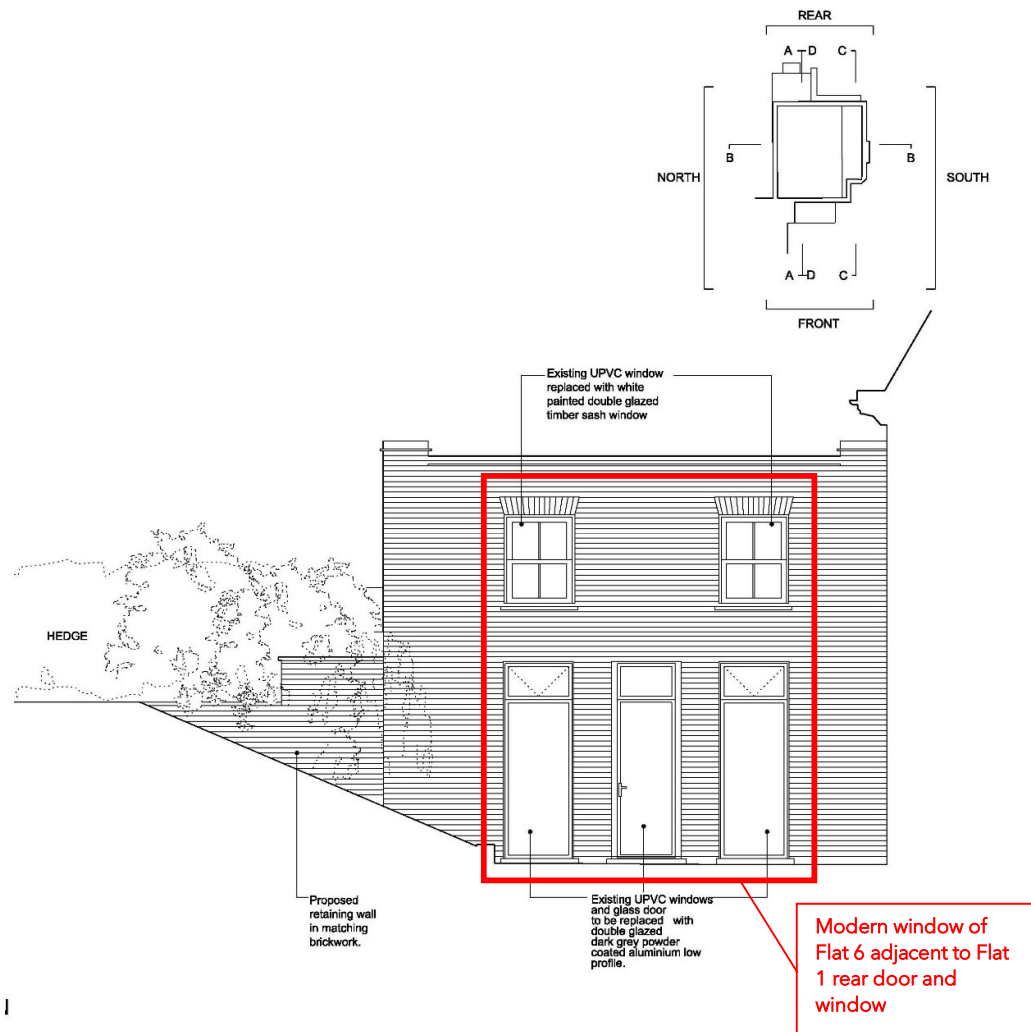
Extract of Side elevation of Flat 6 from planning application ref: 2011/0409/P & 2011/0410/L
